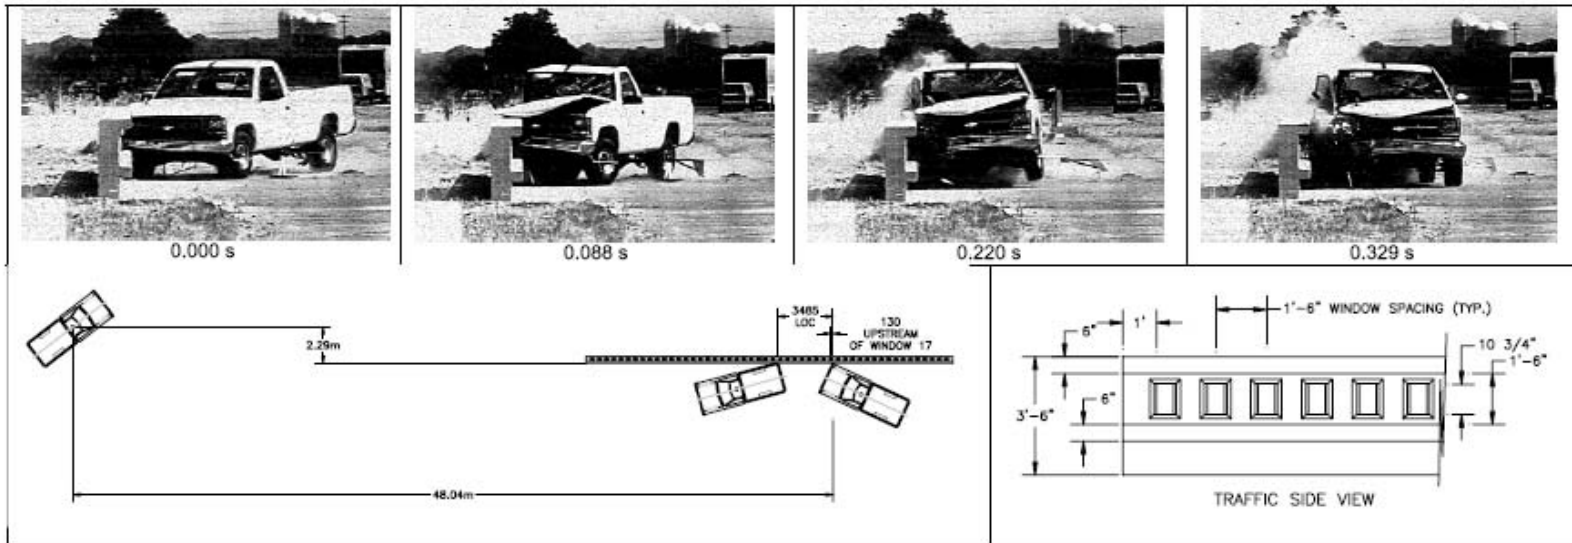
NDOR Aesthetic Open Concrete Bridge Rail
